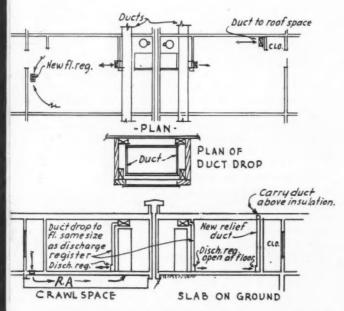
Non-recirculating systems, over a crawl space, lacking circulation, should have a new closed return as shown, left. Over slabs, vent rooms to attic (right) from return at floor level.
